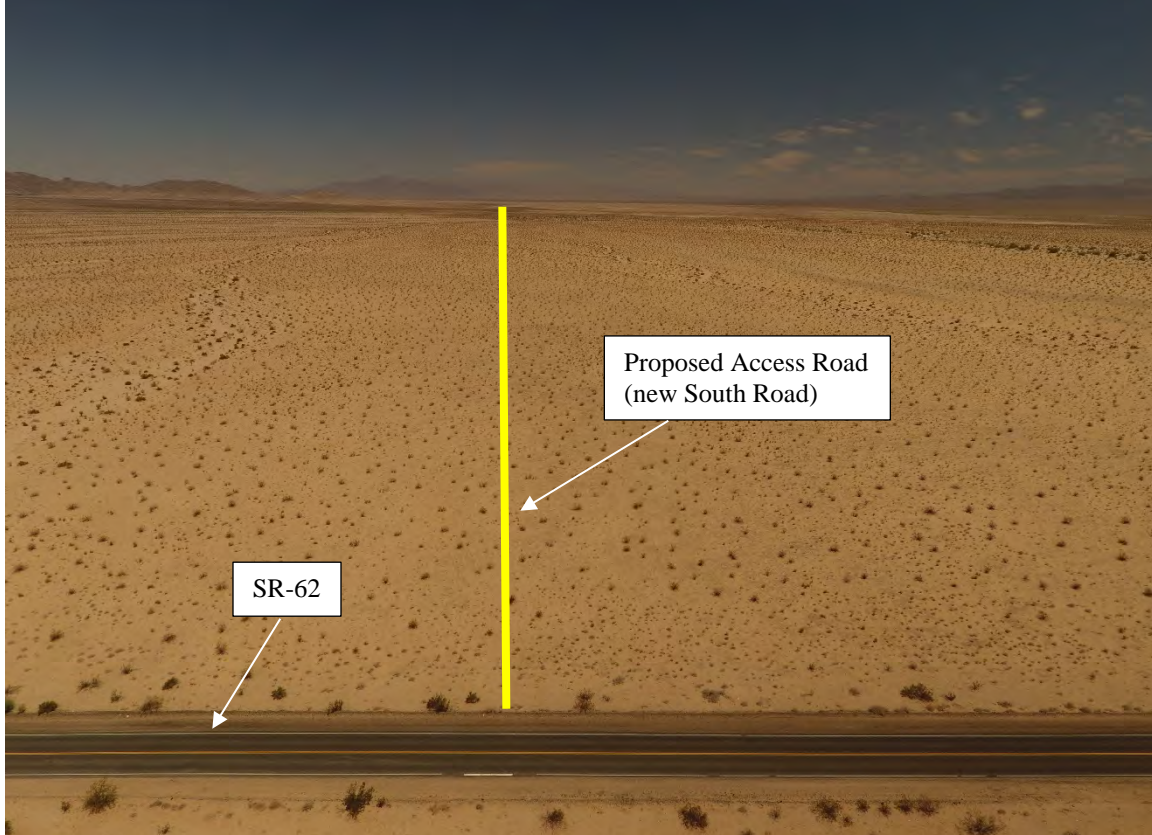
Allscale scrub habitat adjacent the south side of Danby Playa, looking north along the proposed new South Road alignment.
